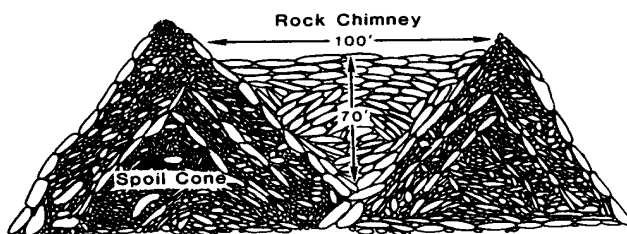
Schematic cross section of 70-foot-deep, V-shaped rock chimney for infiltration basin.
